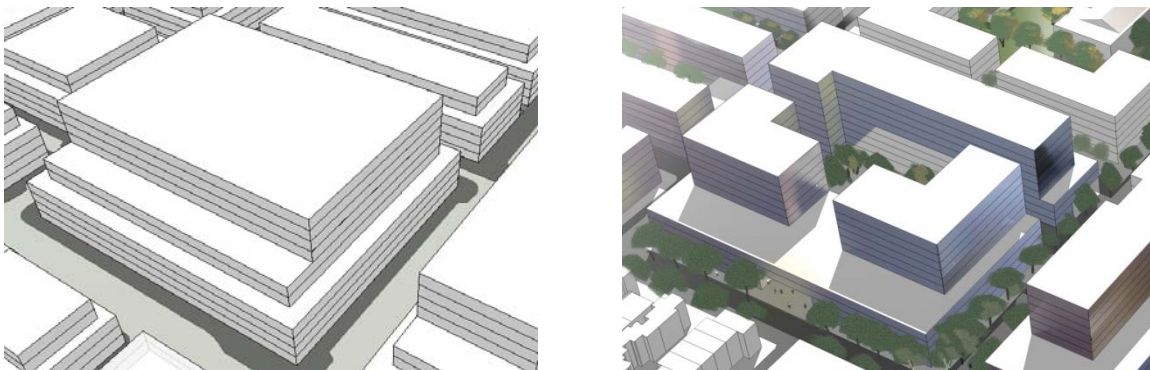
Comparison between building envelope versus potential building footprint for Sub-precinct 1.5
